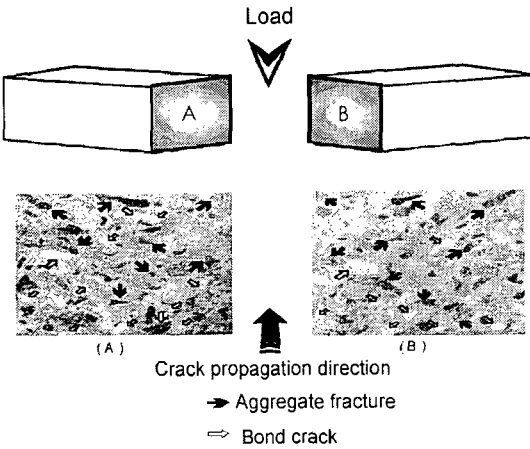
Typical example showing the characteristic of fracture surface of concrete specimen
